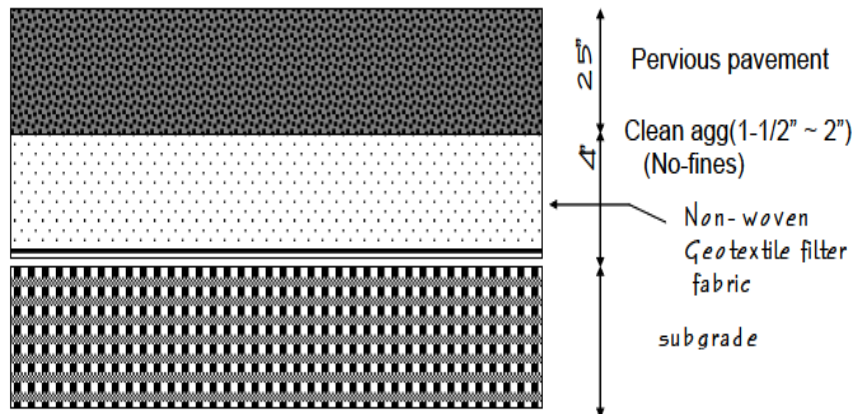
Typical Parking & Driveway Pervious Concrete Pavement after (www.stonecreekmaterials.com)
